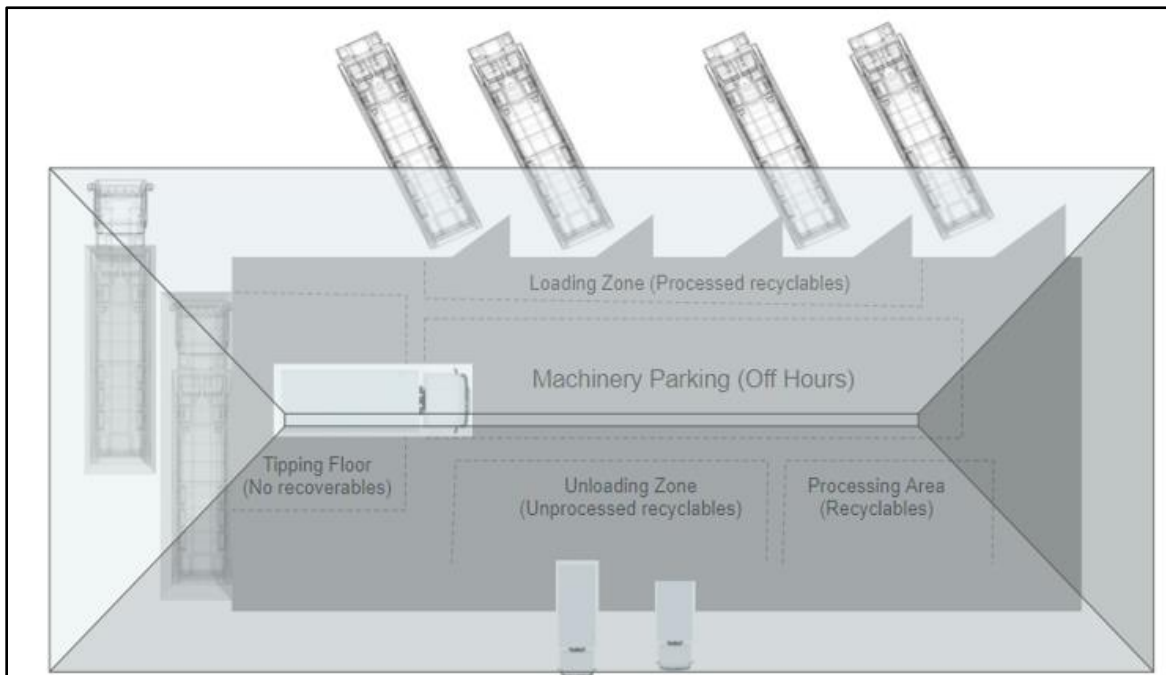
General Layout of the Transfer Center Main floor (Welch, 2021).
